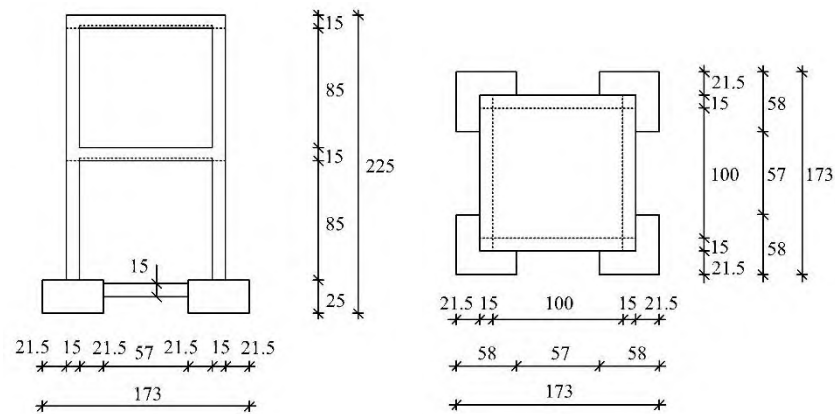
Dimensions and views of the sample; front and side view (left), top view (right) (All dimensions are in 'cm'.)
